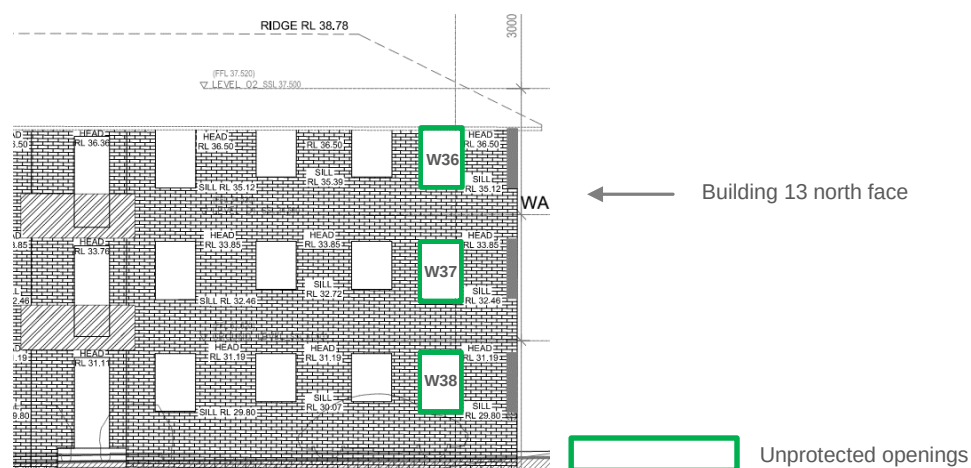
Unprotected openings on northern elevation of 13 Sturt Street
